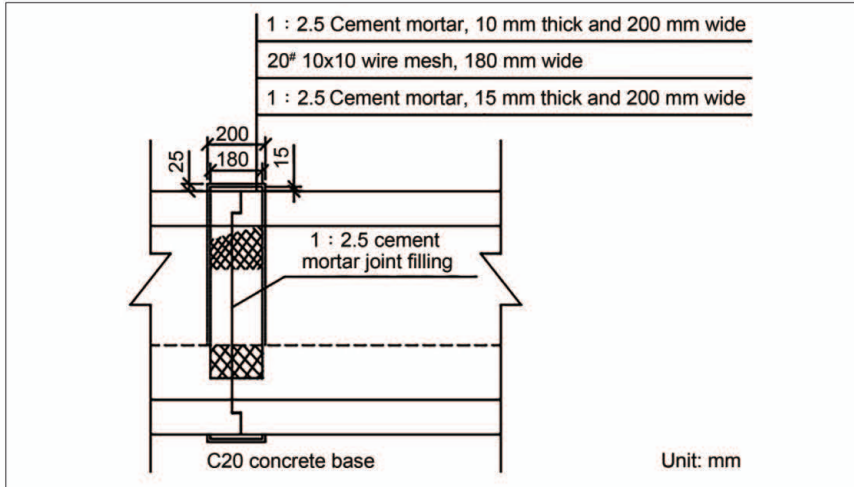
Schematic diagram of central pipe and ditch base and joint
